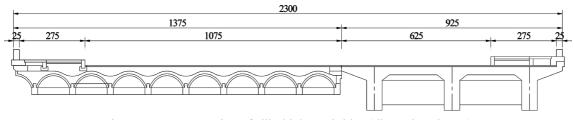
Transverse section of Jilin highway bridge (dimensions in cm)
